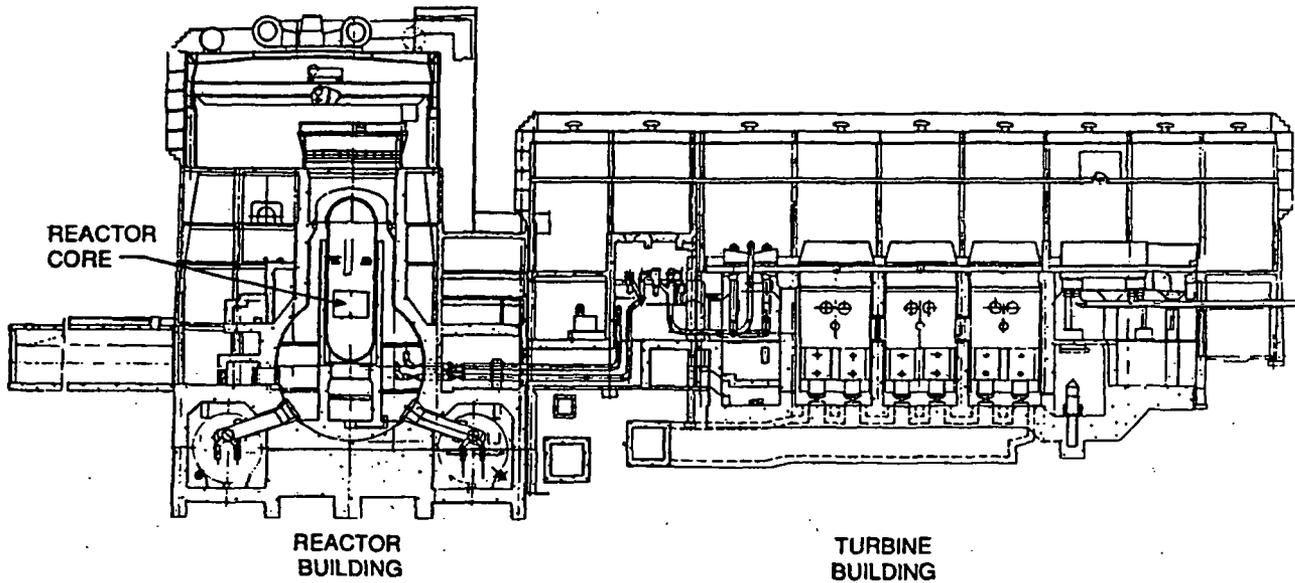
Typical arrangement of reactor building and turbine building for BWR plant of Mark I containment design (from Browns Ferry FSAR)
